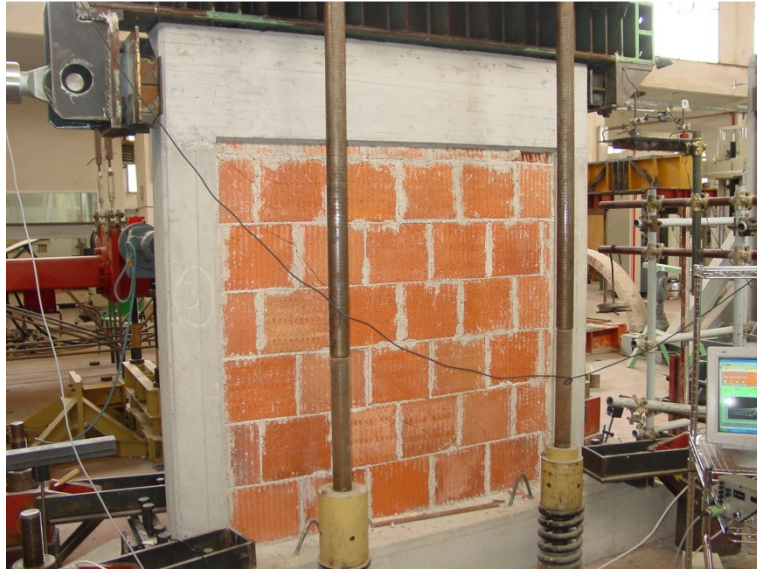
Clay masonry infilled frame specimen in the test apparatus.
